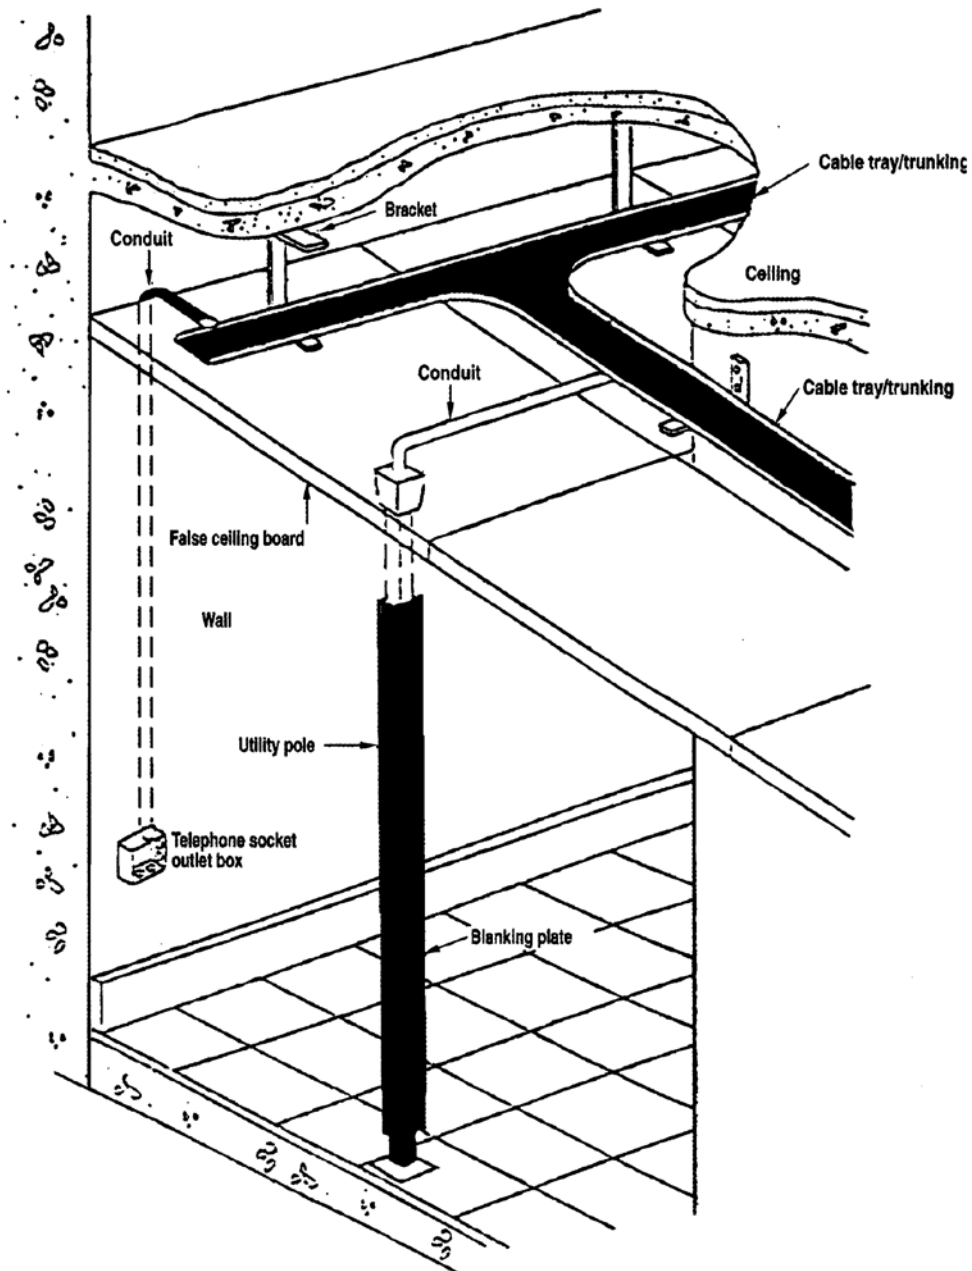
Ceiling distribution system – Typical detail of cable tray / trunking link with conduit in non-detachable false ceiling boards / strips that are not easily removable
